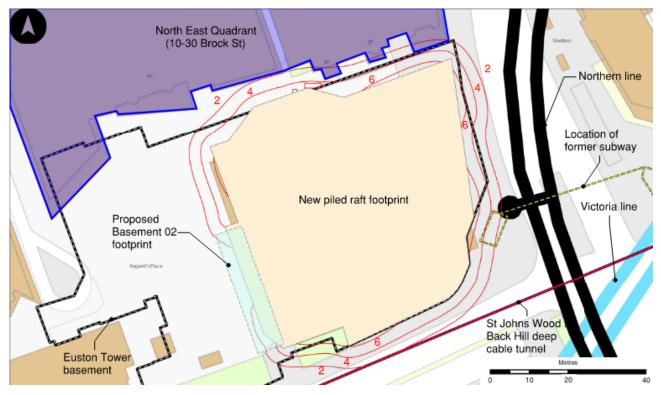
Calculated short term settlement (mm) at basement level +21.6mOD resulting from partial superstructure deconstruction, proposed Basement 02 excavation, and new superstructure loading.
